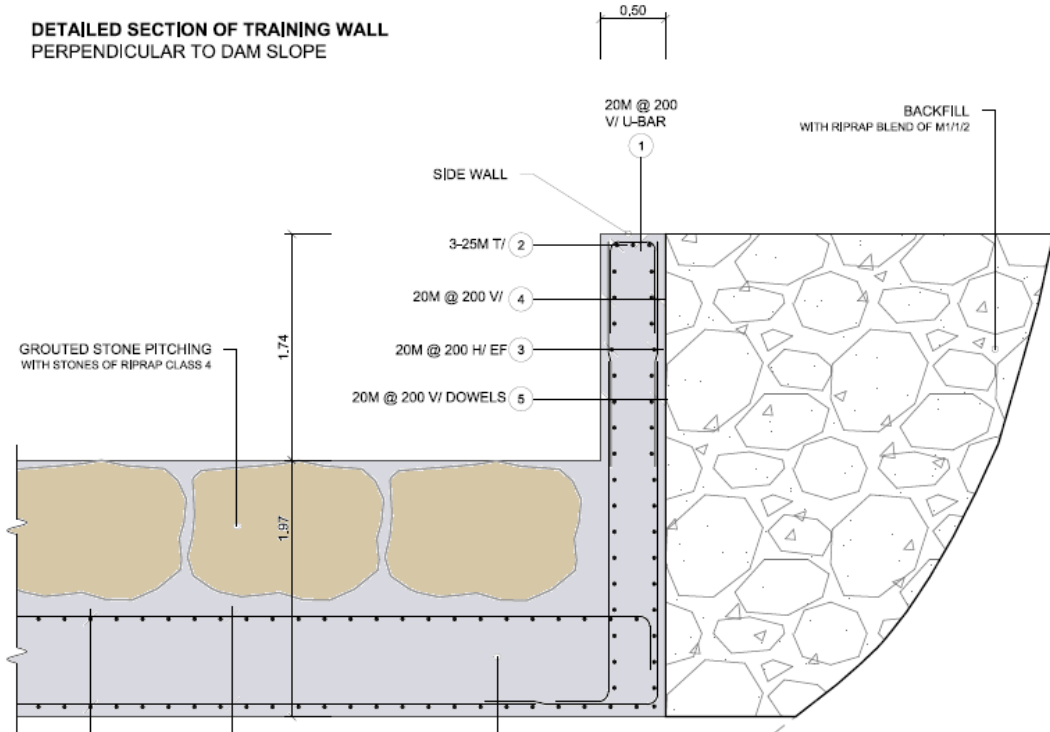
Detail of downstream lining and spillway-training walls (section is normal to the slope - see Drawing LTMM CC-DAM-506)
